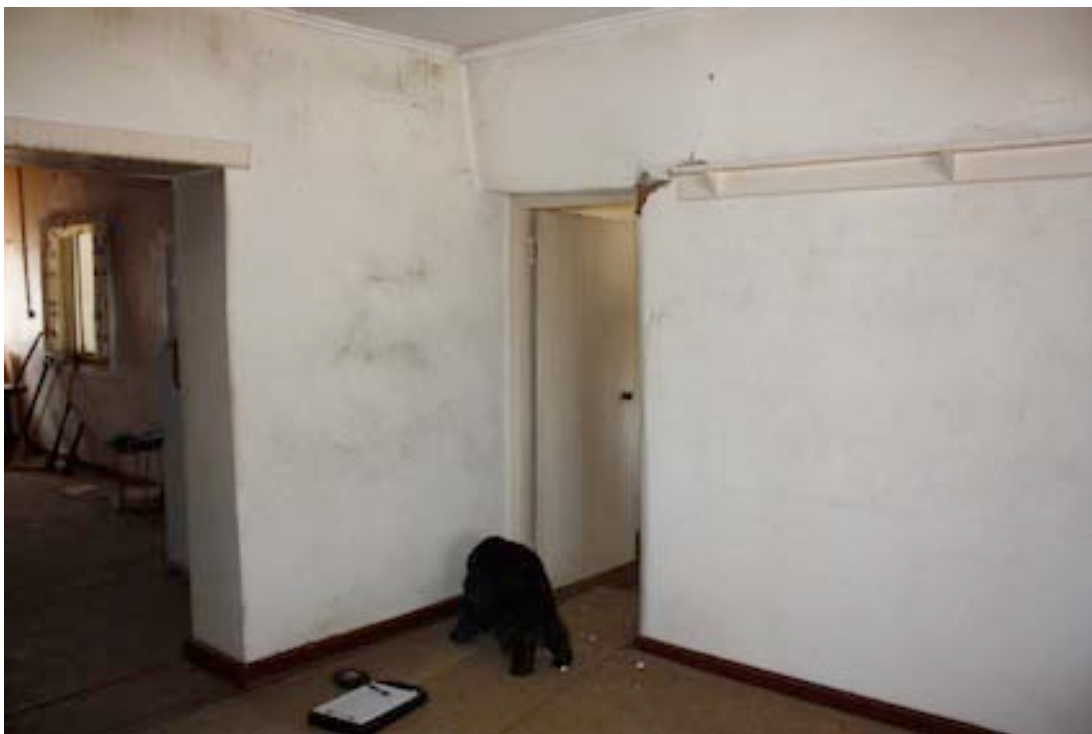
Room 14 looking north towards door to Room 13. Room 16 is visible on the left side of the photograph
